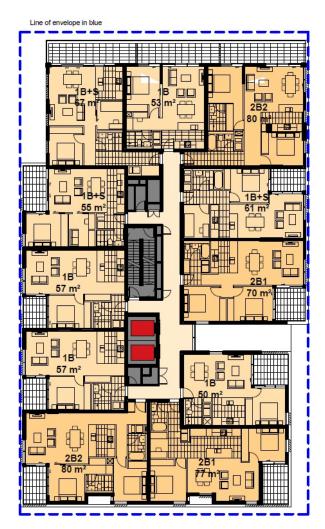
Building Floor Plate Building 1C Source: *Bates Smart
